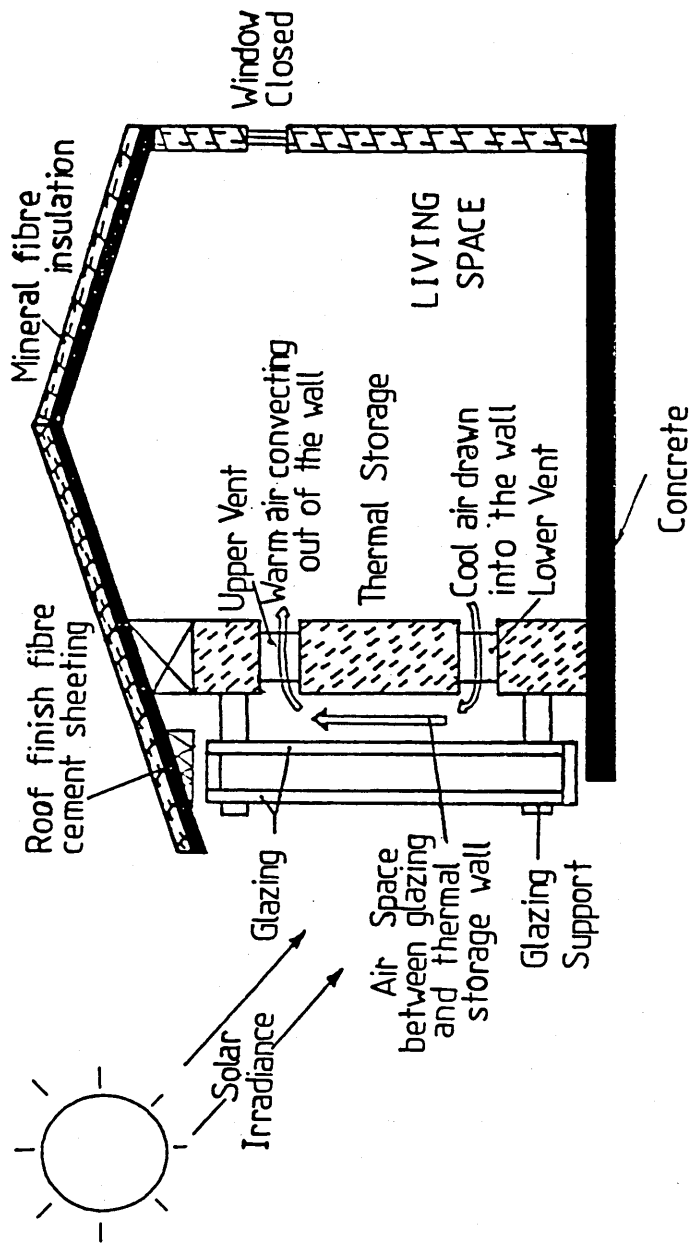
A Trombe thermal storage wall with ventilation ports and double exterior glazing. (X-sectional view)
